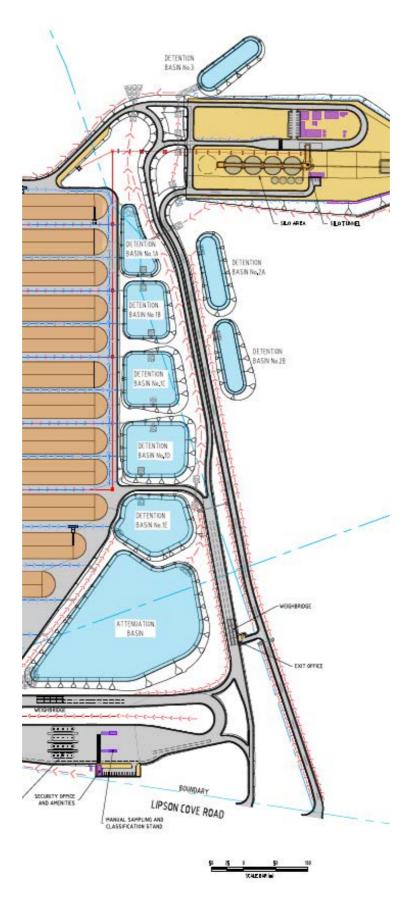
Scenario 2 design – Proposed drainage and stormwater layout
